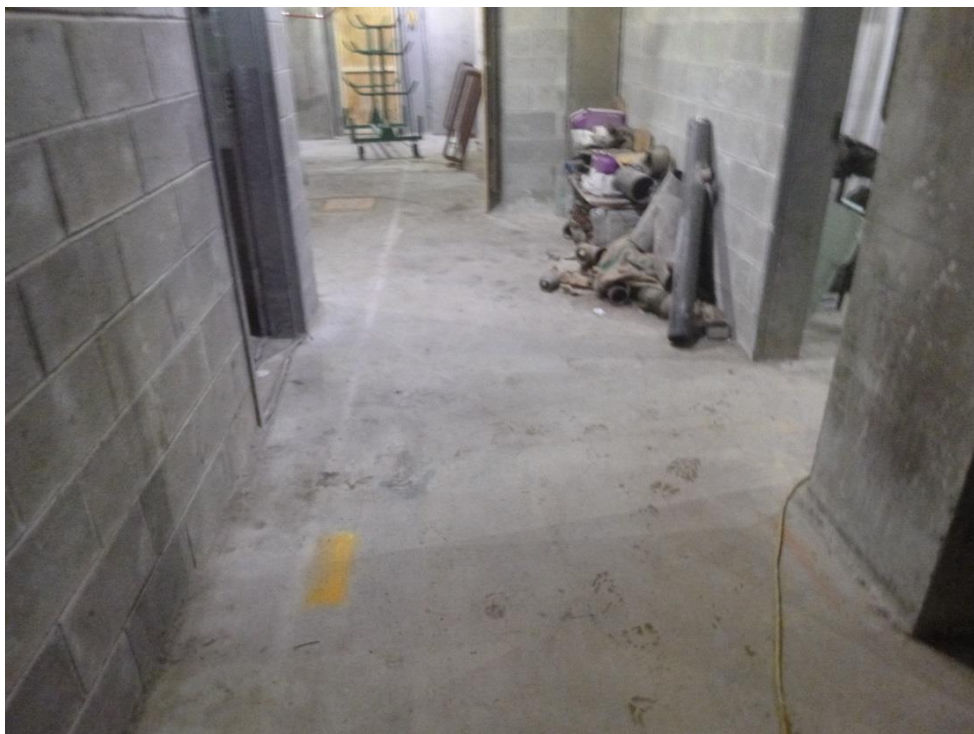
, 03/01/2017: View of concrete building slab composite cover (facing north).
